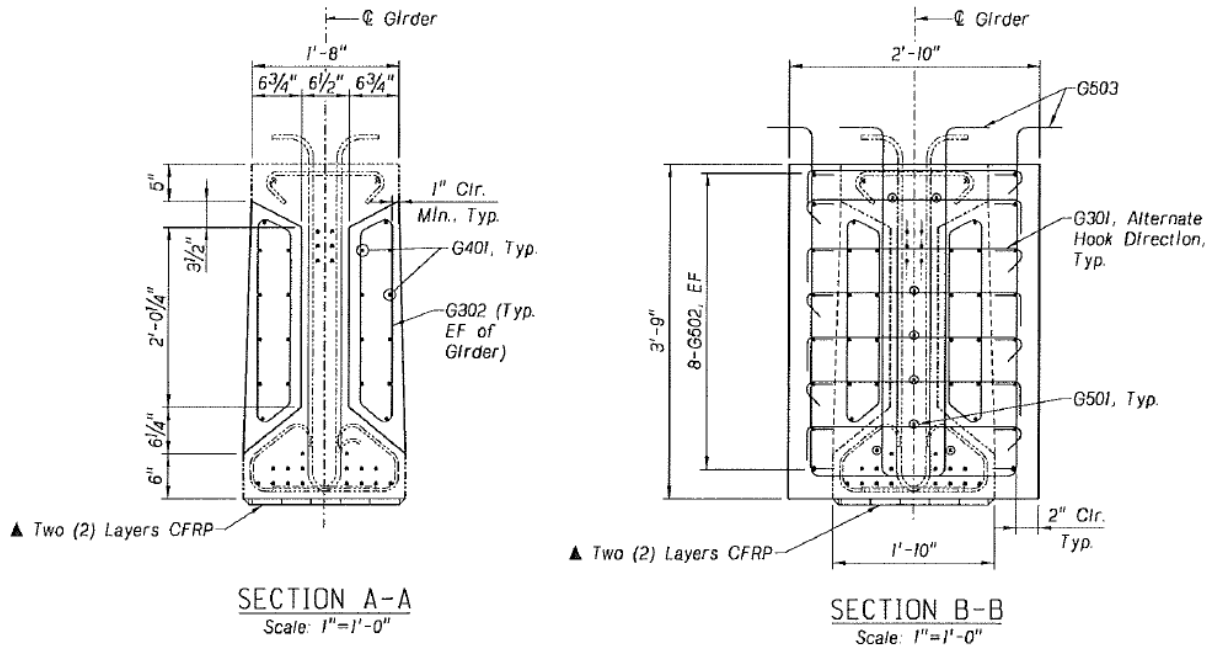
Detail of girder end encasement reinforcement and CFRP layers, from the repair documents of Kearney South Platte River Bridge, courtesy of NDOT
